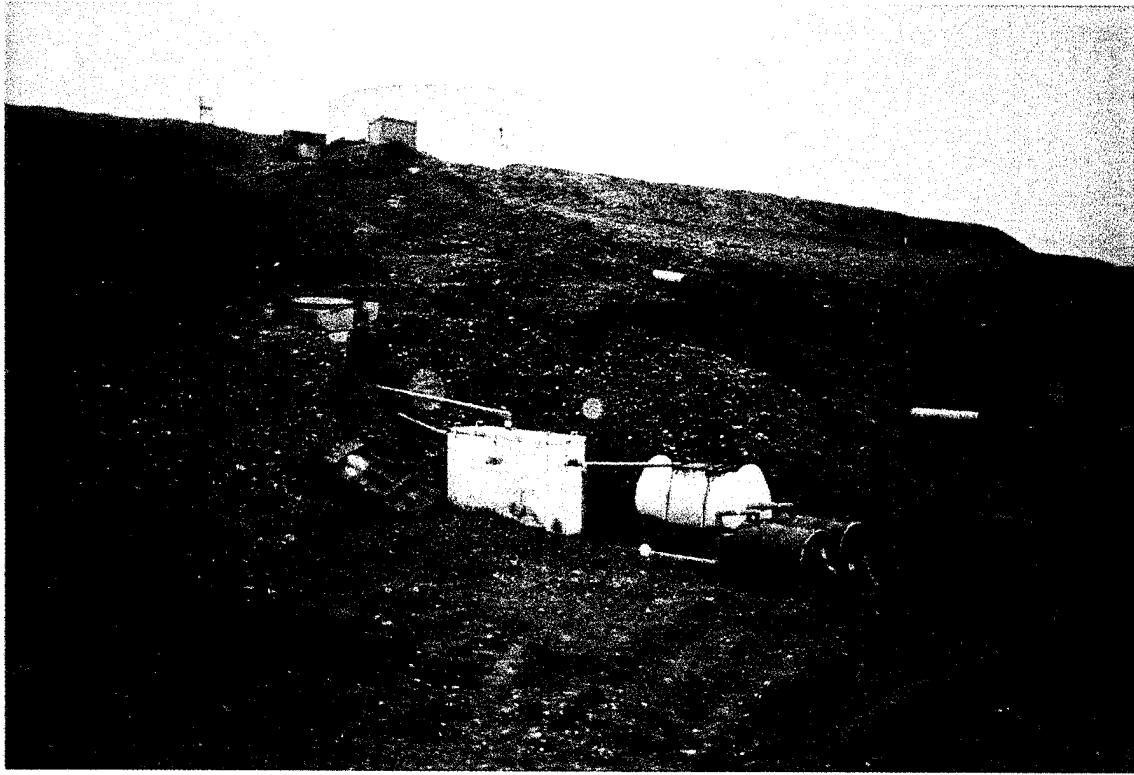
The liner was placed on the bottom and downhill side of the trenches.
